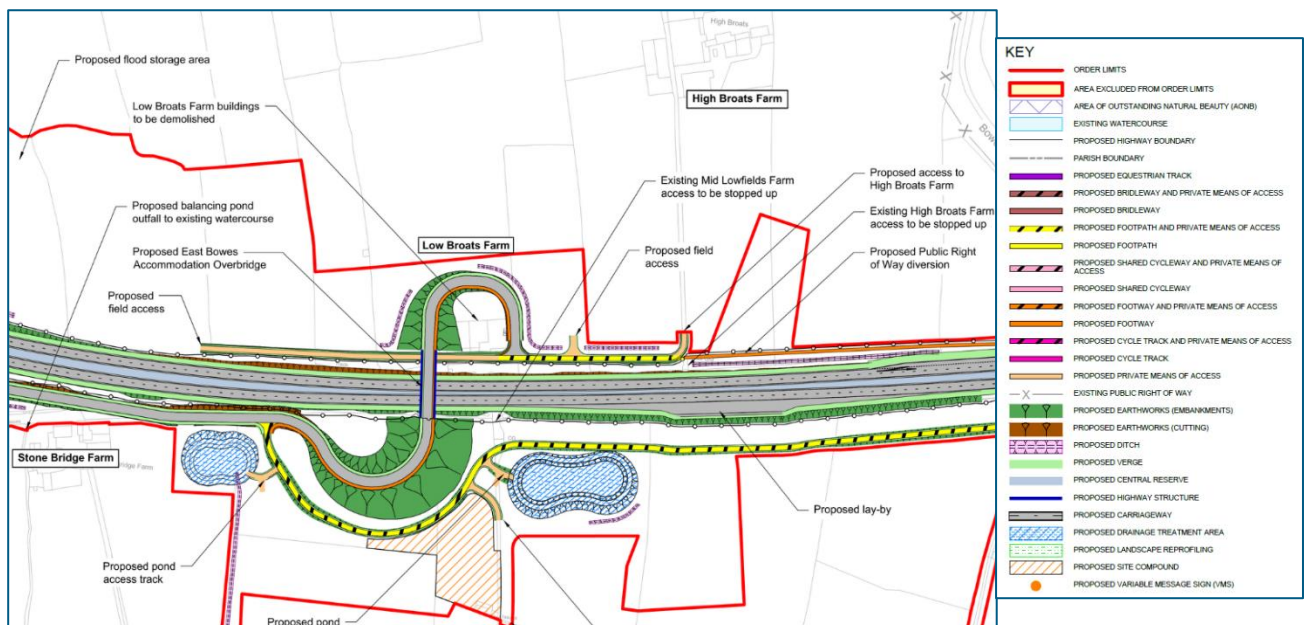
(a) Extract from General Arrangement Plans (Before)
